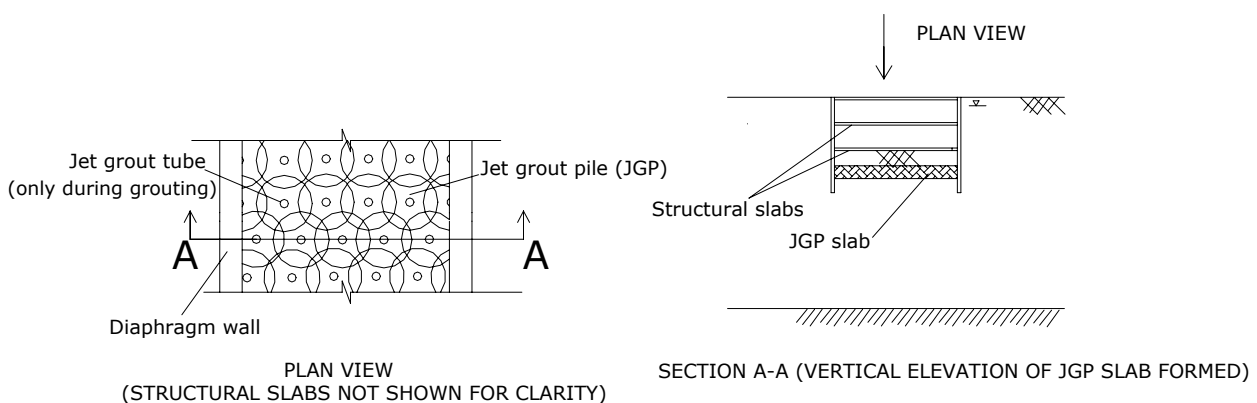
JGP grid, completed piles viewed in plan and elevation (slab).
